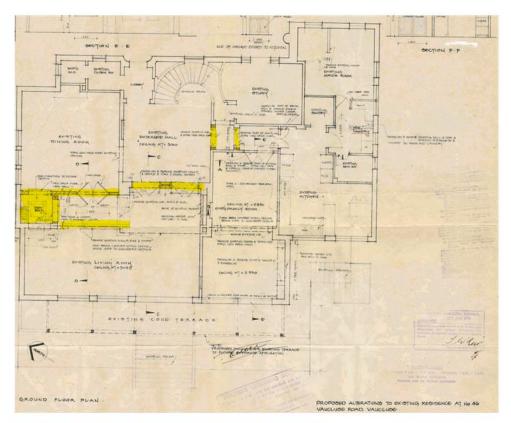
Kubany scheme ground floor plan, with works not carried out shown highlighted.
